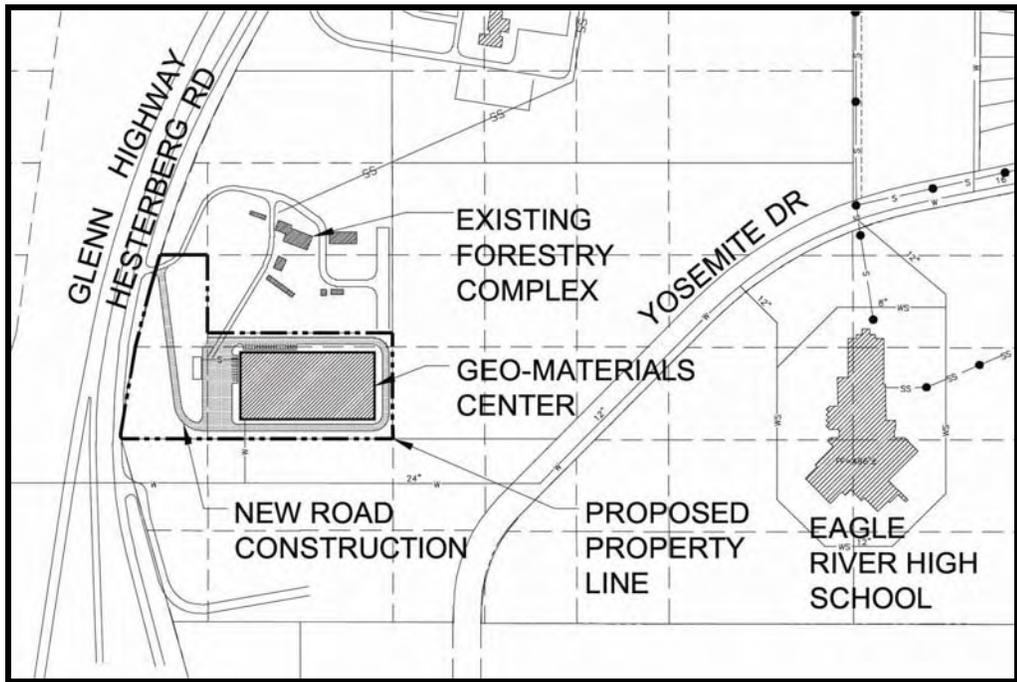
Site Plan (Option 2) Access near Hesterberg Road
